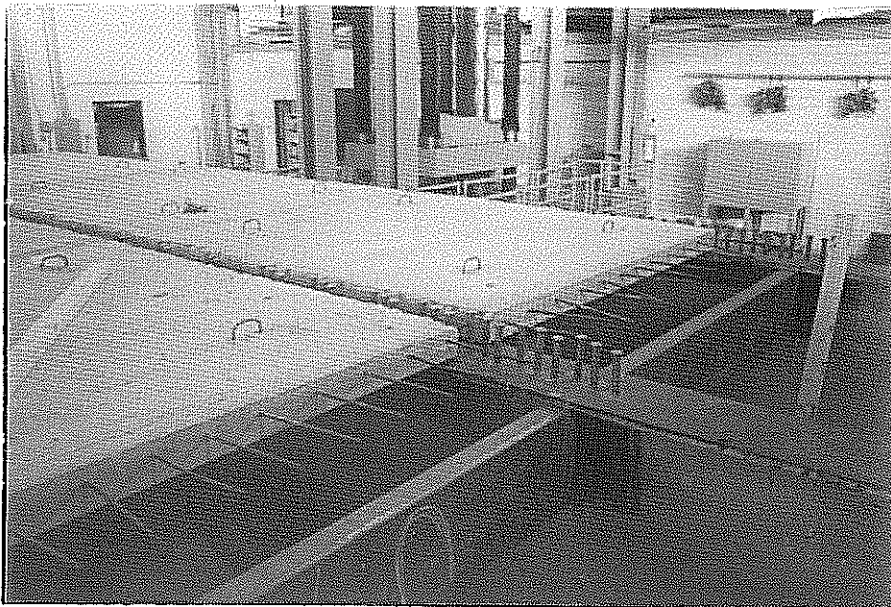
Precast panels in position near south end of the bridge specimen
